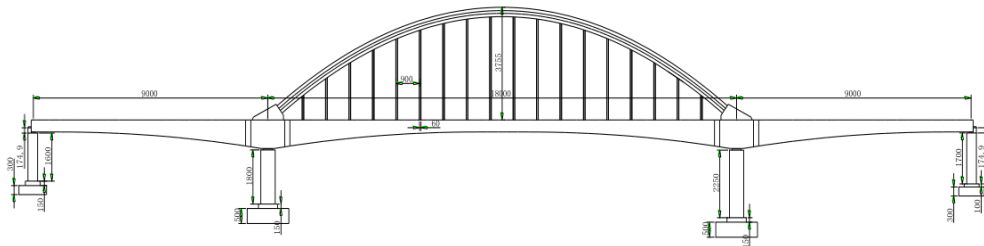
Overall Layout of the Bridge. (Unit: Cm)
